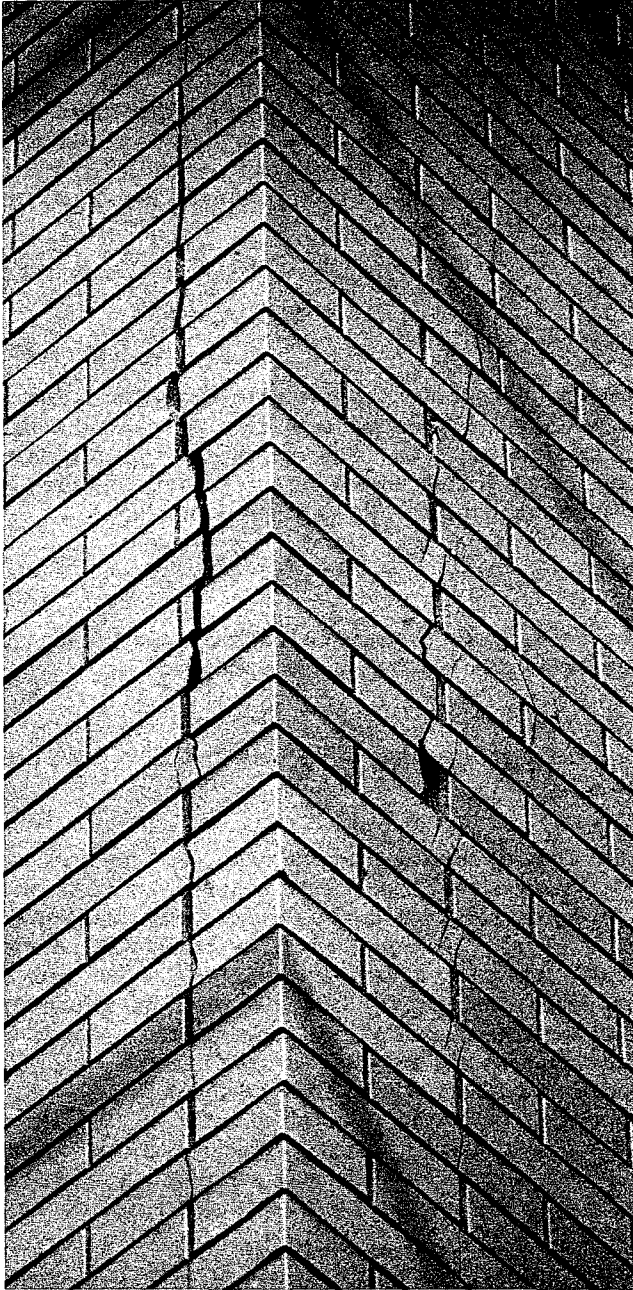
Vertical corner cracking of masonry veneer associated with lack of movement joint and discontinuous shelf angle at corner.
